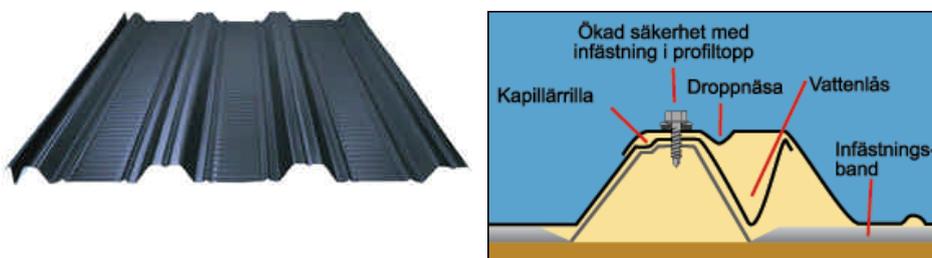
The Plannja 40 sheeting has been developed to avoid water leakage.
